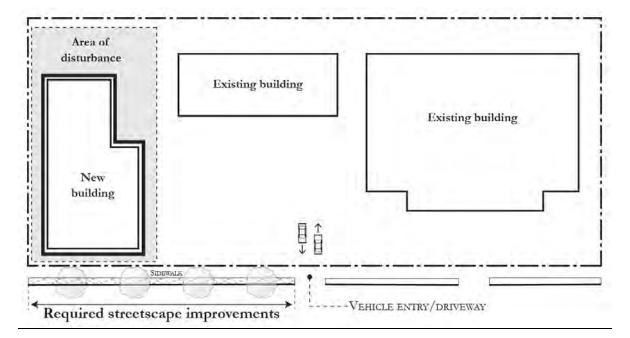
Shopping Center Streetscape Improvement Requirement
